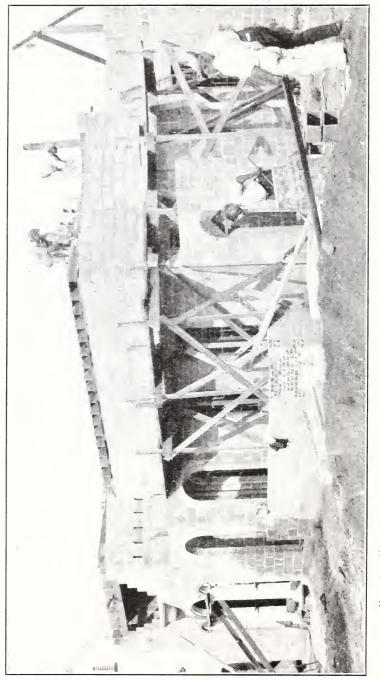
House being constructed of rough-fuced concrete block to serve as a base for Portland cement stucco
